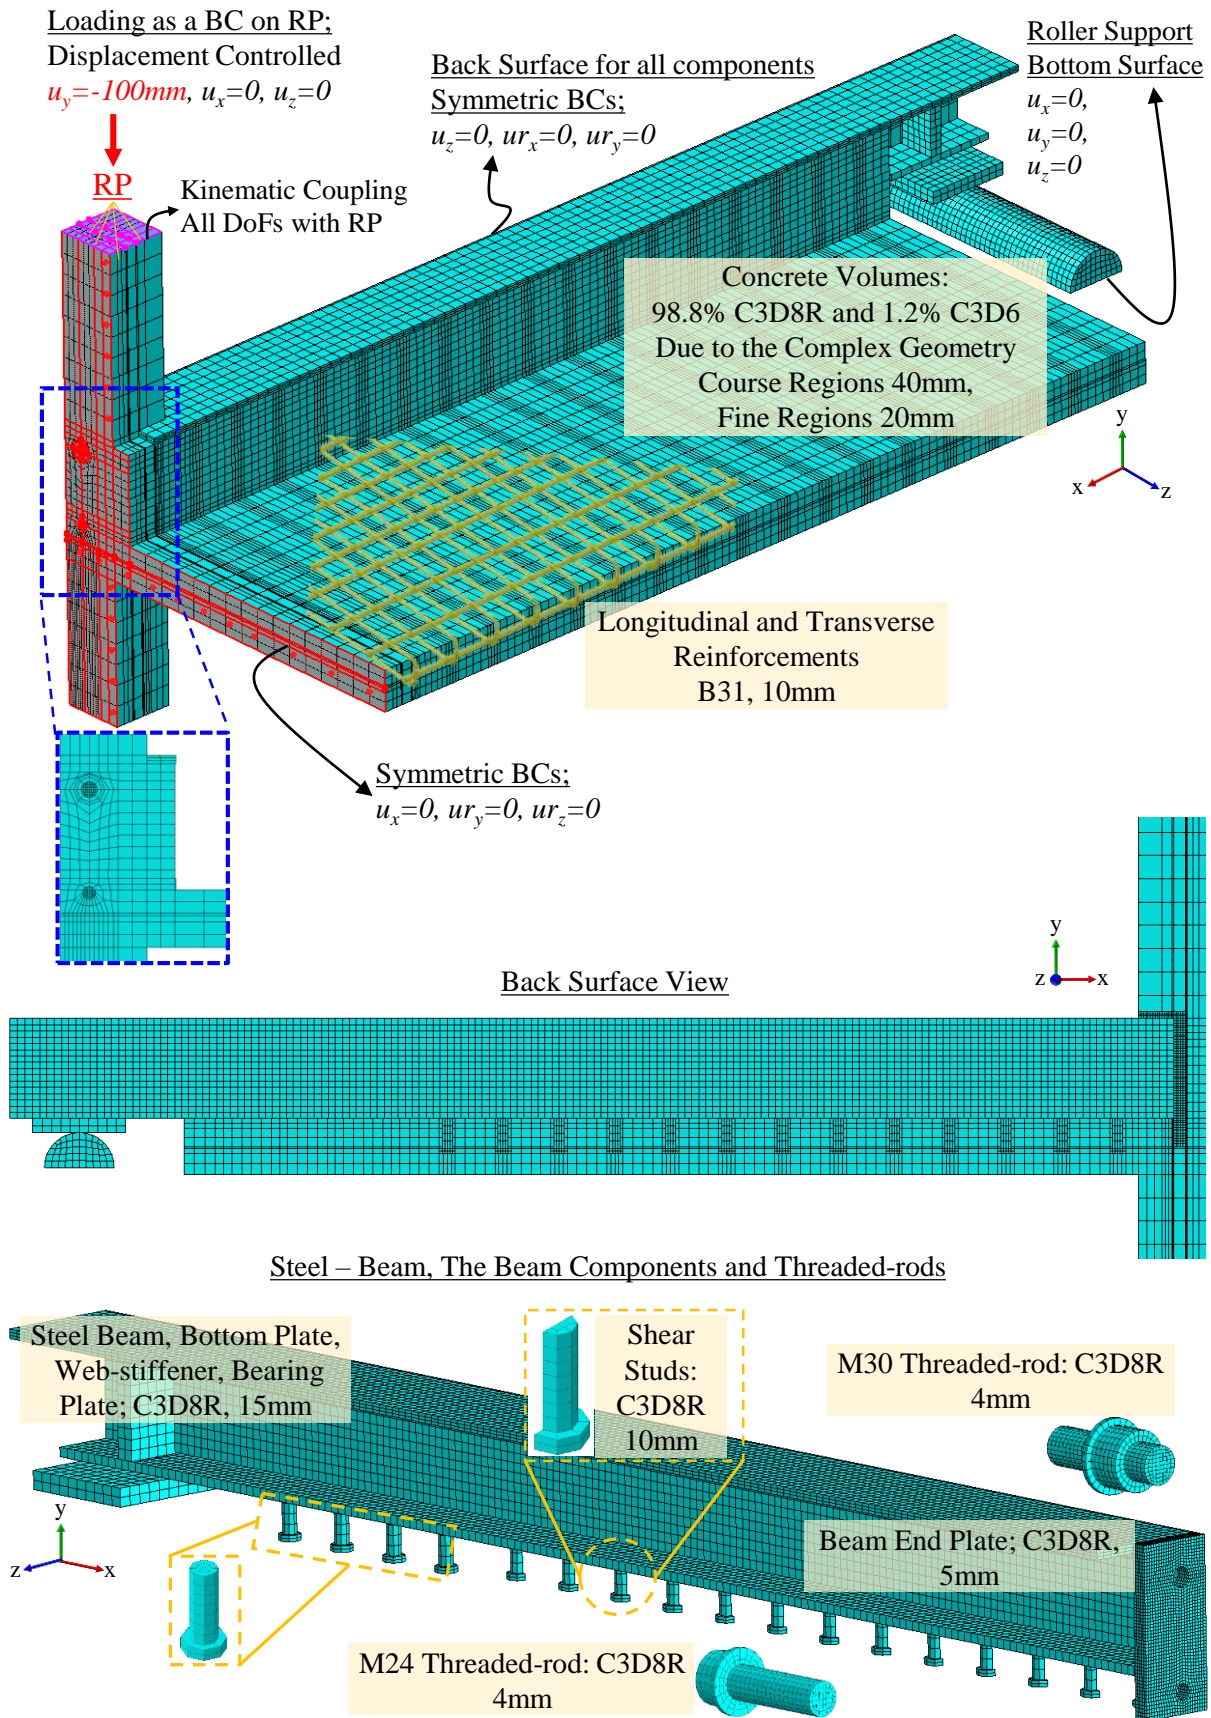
FE-Model Details of GJSFB-02 test specimen.
